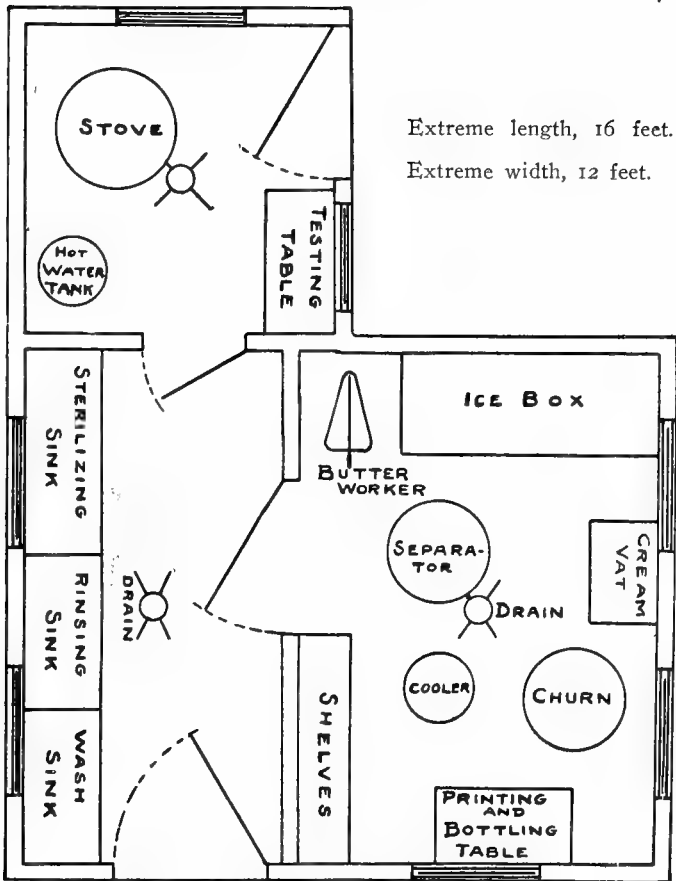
Floor Plan of Dairy House for Retail Milk.
